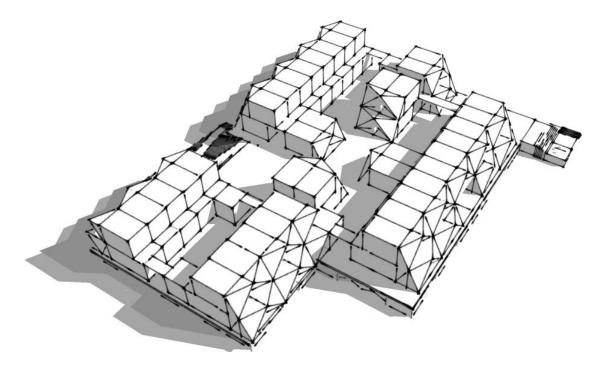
sketch of site layout, showing the basic shadow effect of buildings.
